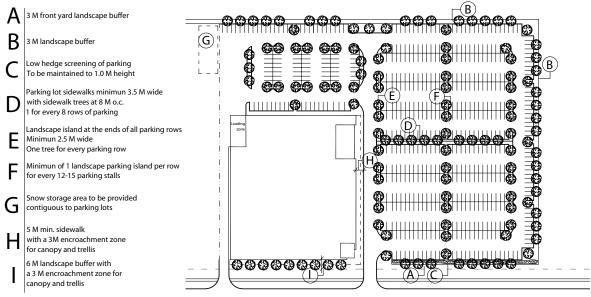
Landscaping should be used to define smaller parking areas and site edges.
